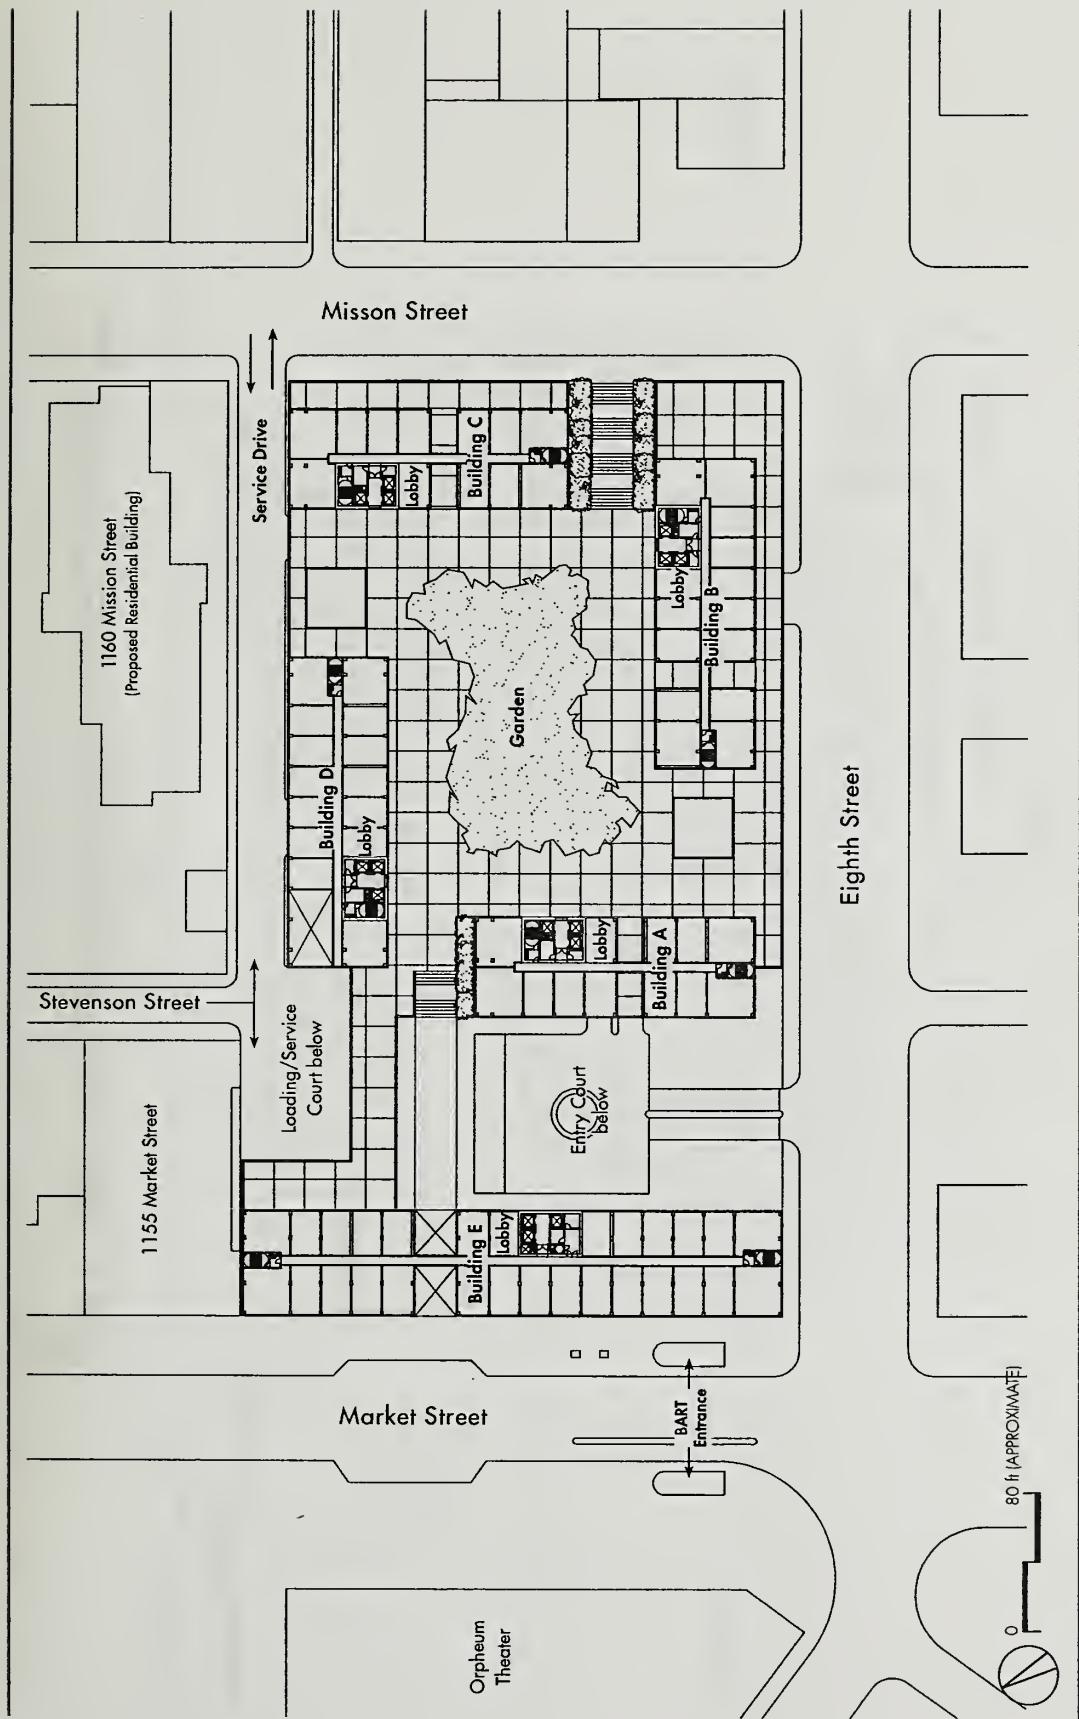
PLAZA LEVEL FLOOR PLAN
